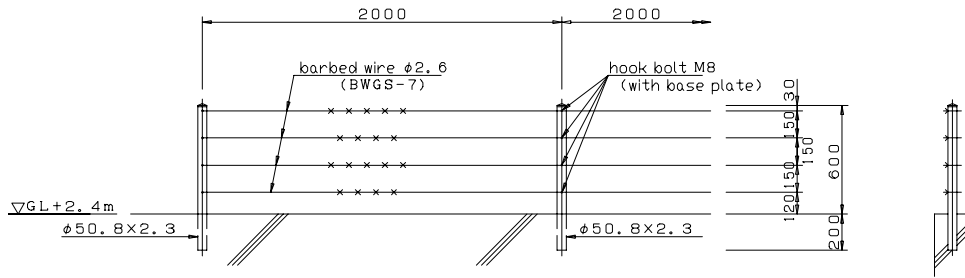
Example of Installation of Erect Top Guard (barbed wire) on the Wall
